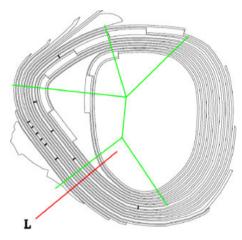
Geotechnical sections in Chadormalu iron open pit mine and studied cross-section in southern wall (Kani Kavan, 2008)
